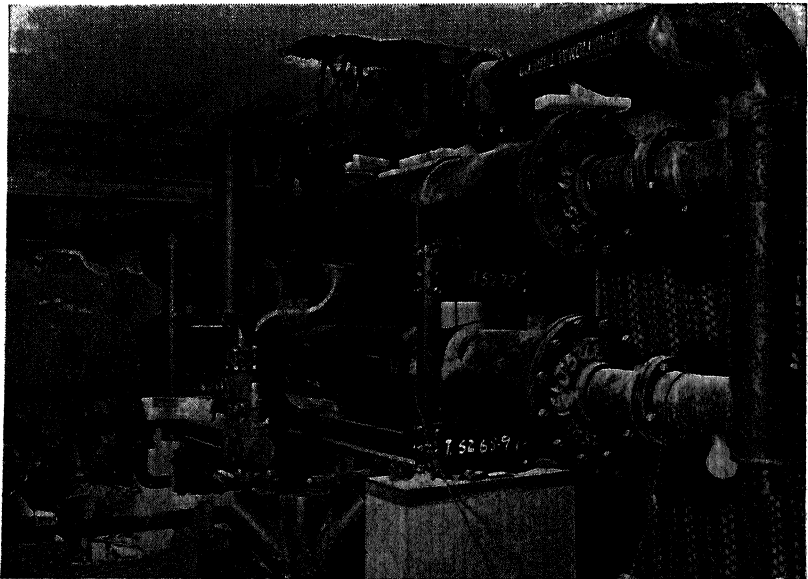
Arc welded piping installation. Part of an air conditioning system in an 8-story department store. Total of 3,400 ft. of pipe ranging from 10-in. to 11/4-in. all arc welded.
